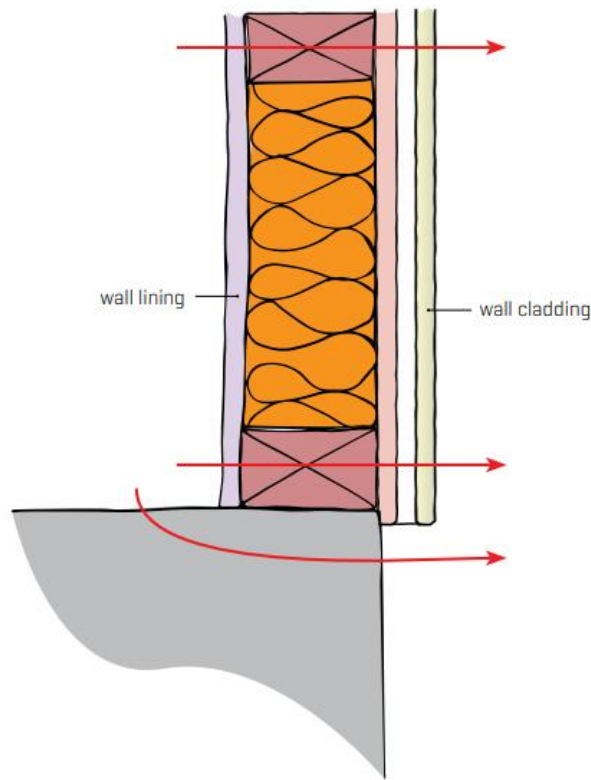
Typical thermal bridges through the wall and the concrete slab [41]
